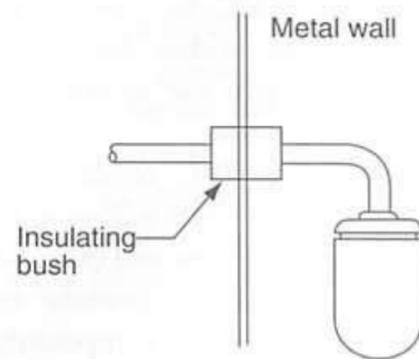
A precaution that may be used where metal conduit passes through a conductive wall
